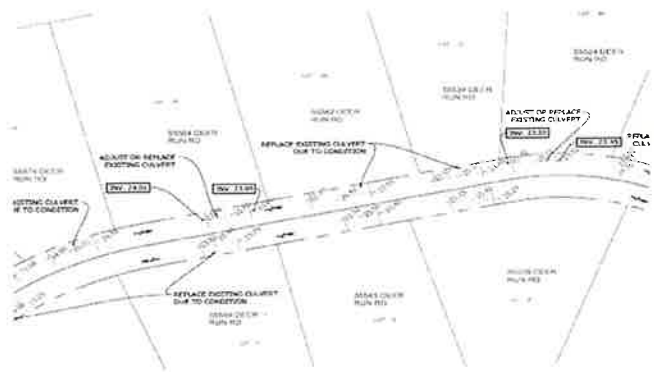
Excerpt of Spring Lake Estates Construction Plans
